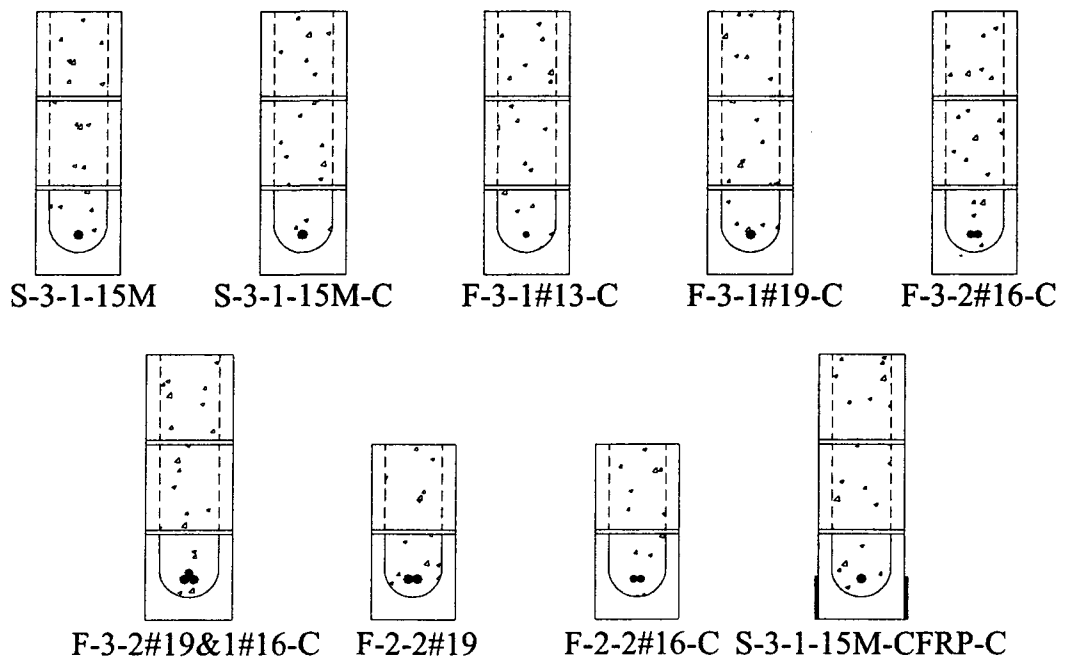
Cross-sections of the full-scale reinforced concrete masonry beams
